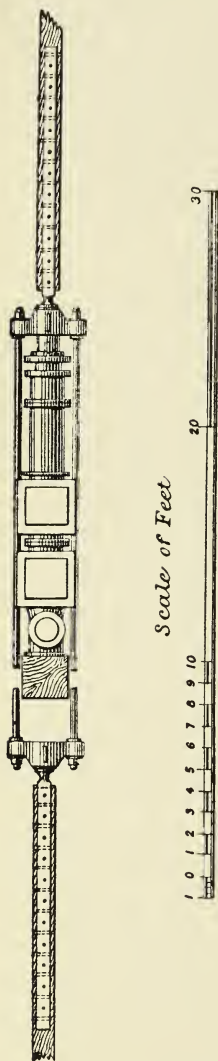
ARRANGEMENT OF FORCING SETS OF PUMPS IN A SHAFT.
